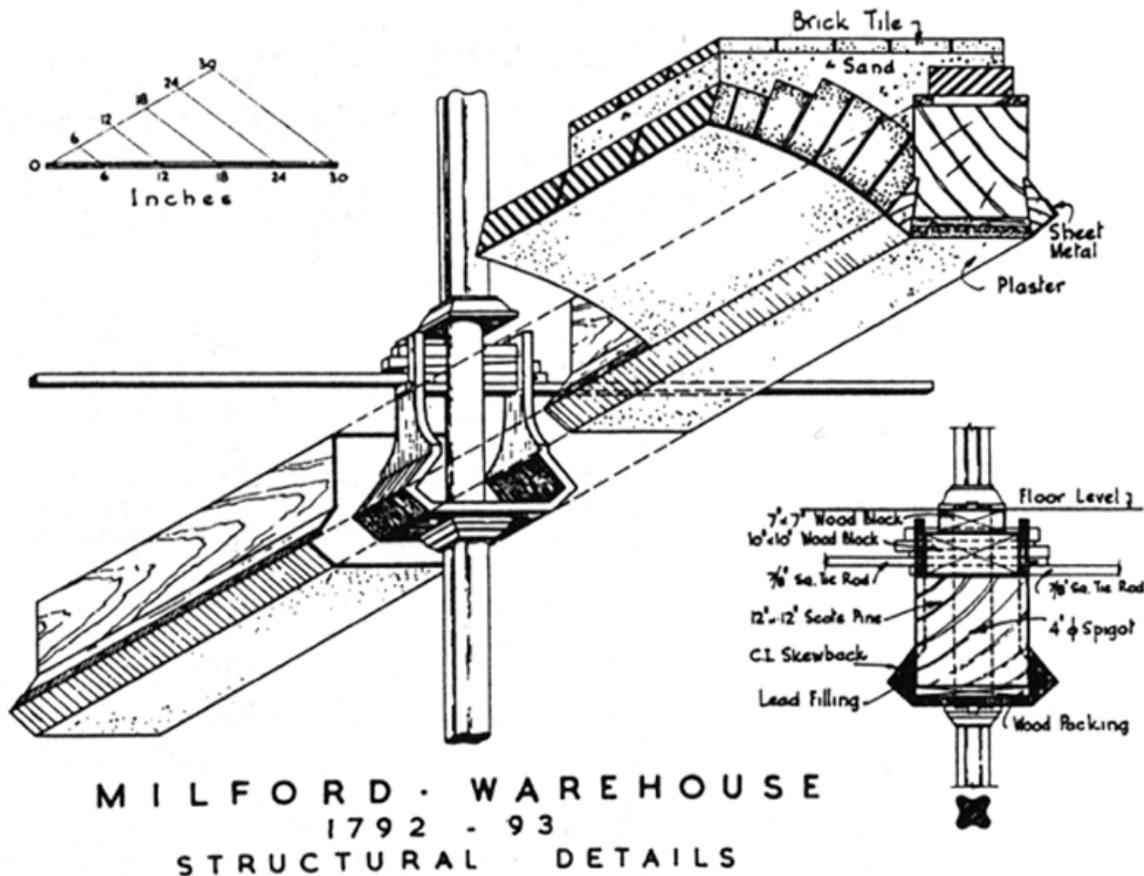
Structural detail of Milford Warehouse, William Strutt, 1793. (Johnson and Skempton)
